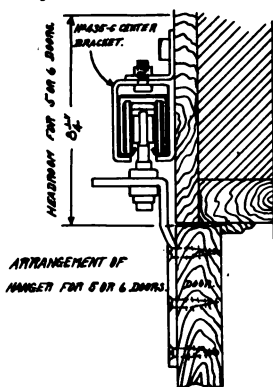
SHOWING ARRANGEMENT OF HANGER FOR FIVE AND SIX DOOR OUTFITS
